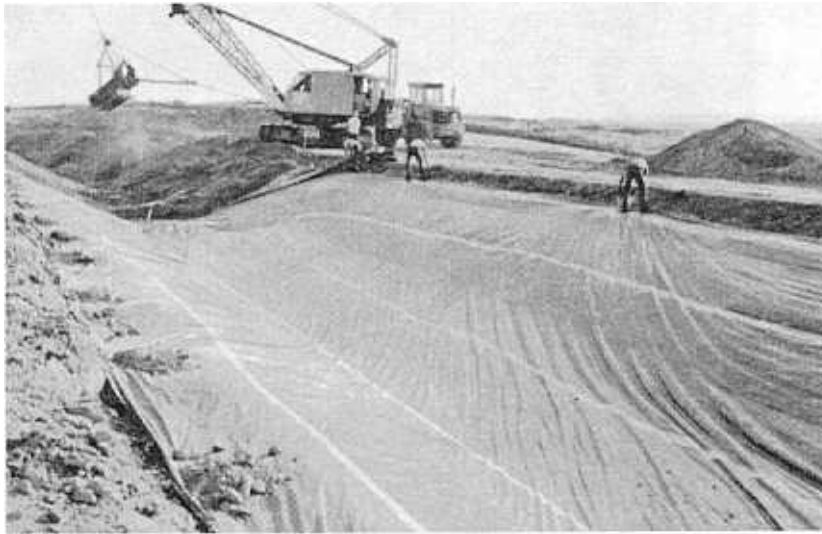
View of soil mounds to temporarily anchor PVC geomembrane.
